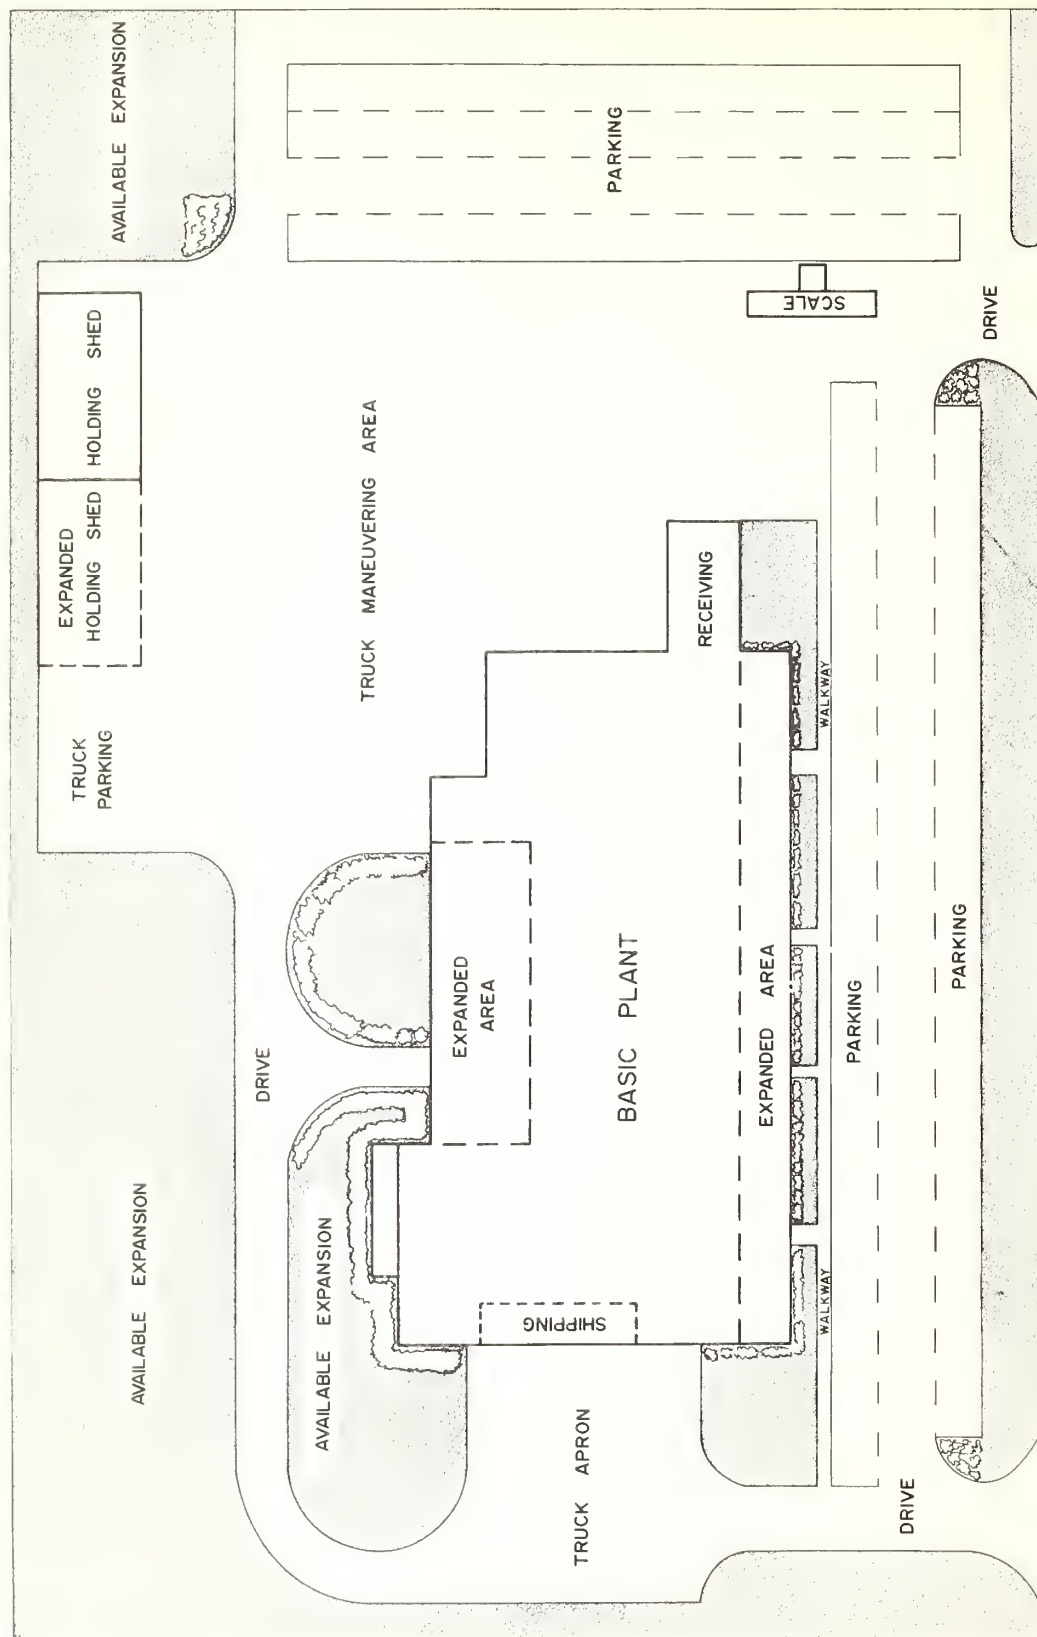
Property plat for model poultry-processing plant shows building and area arrangement.
